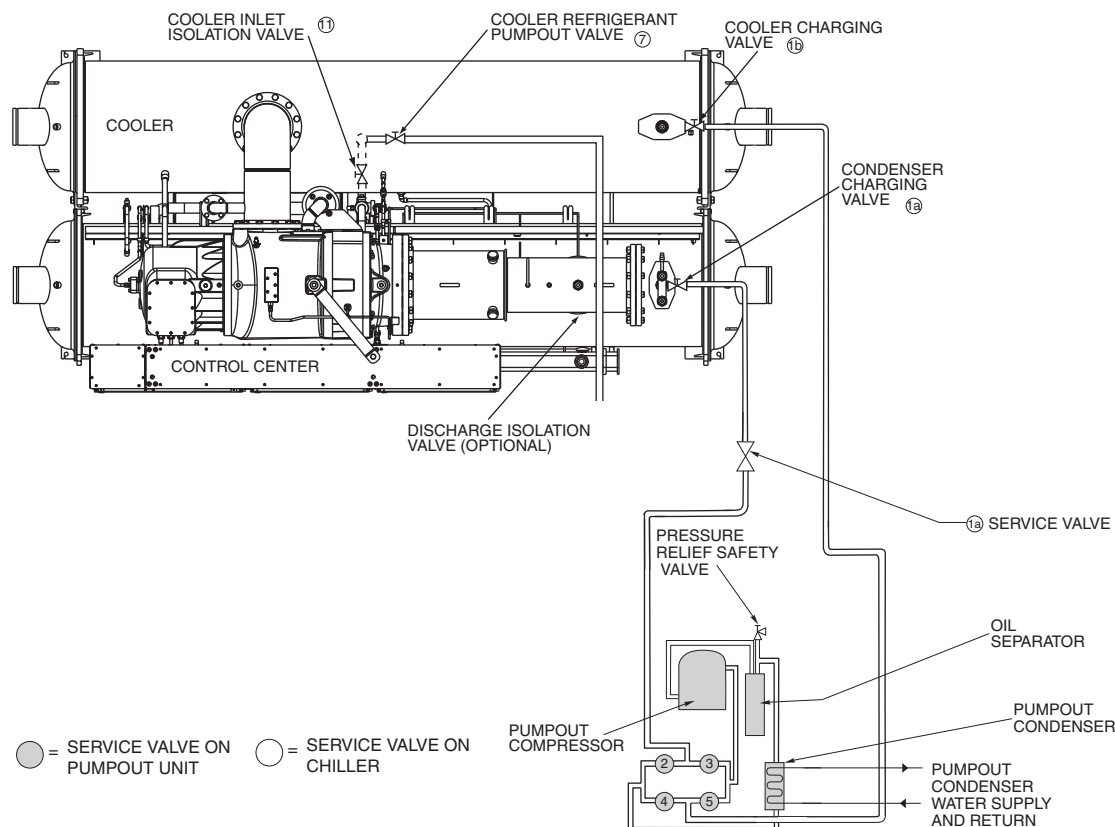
Optional Pumpout System Piping Schematic without Storage Tank — Configured to Store Refrigerant in Cooler or Condenser (Unit with R Compressor Shown)
